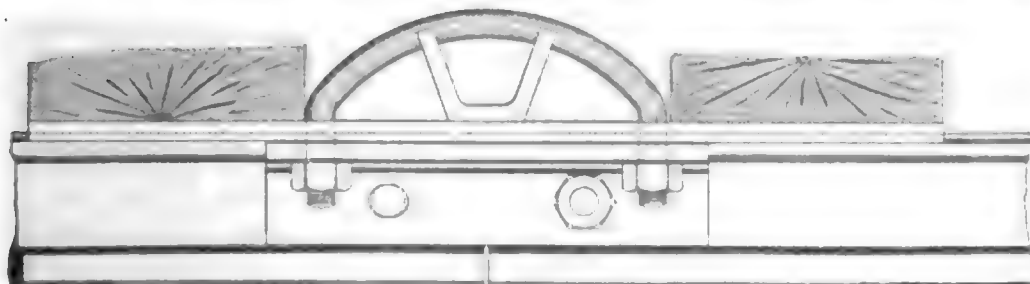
BRIDGE-JOINT, TRUSS FORM.
